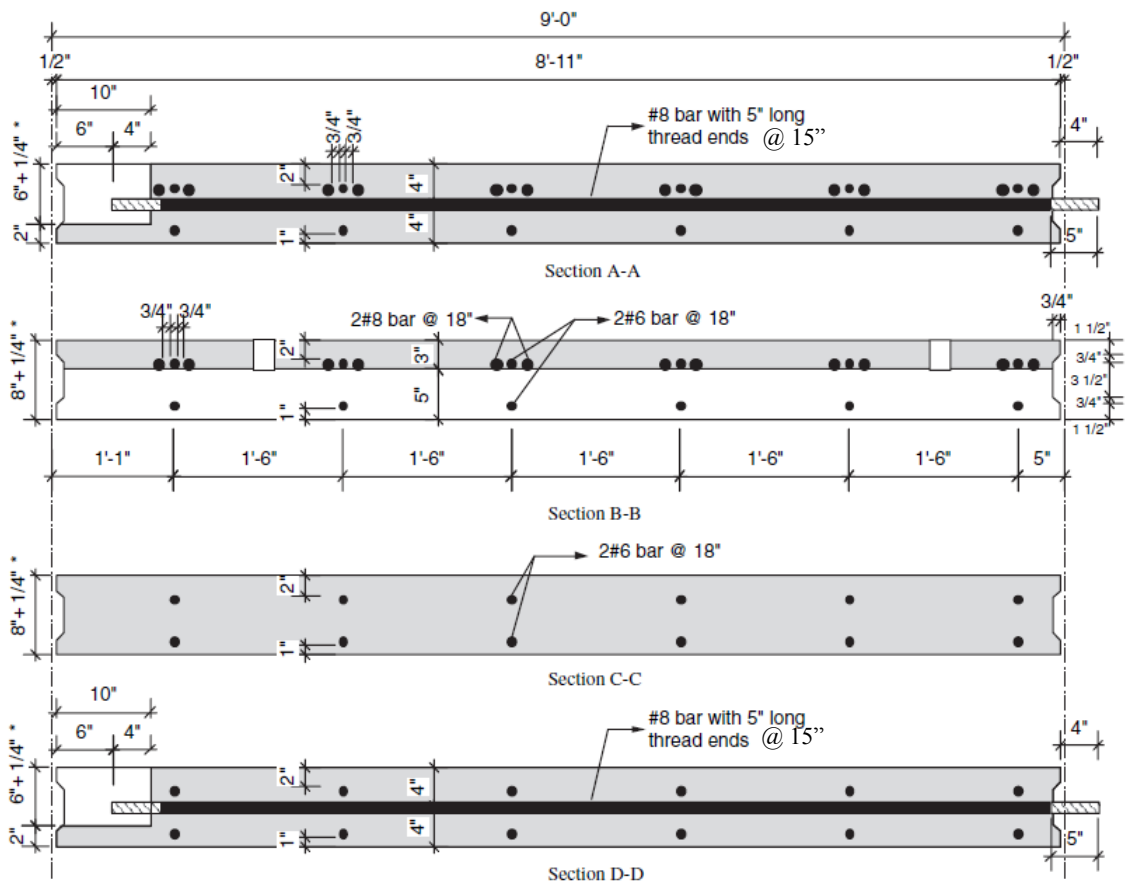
NCHRP System CD-2 Cross Sections (Badie and Tadros 2008)
